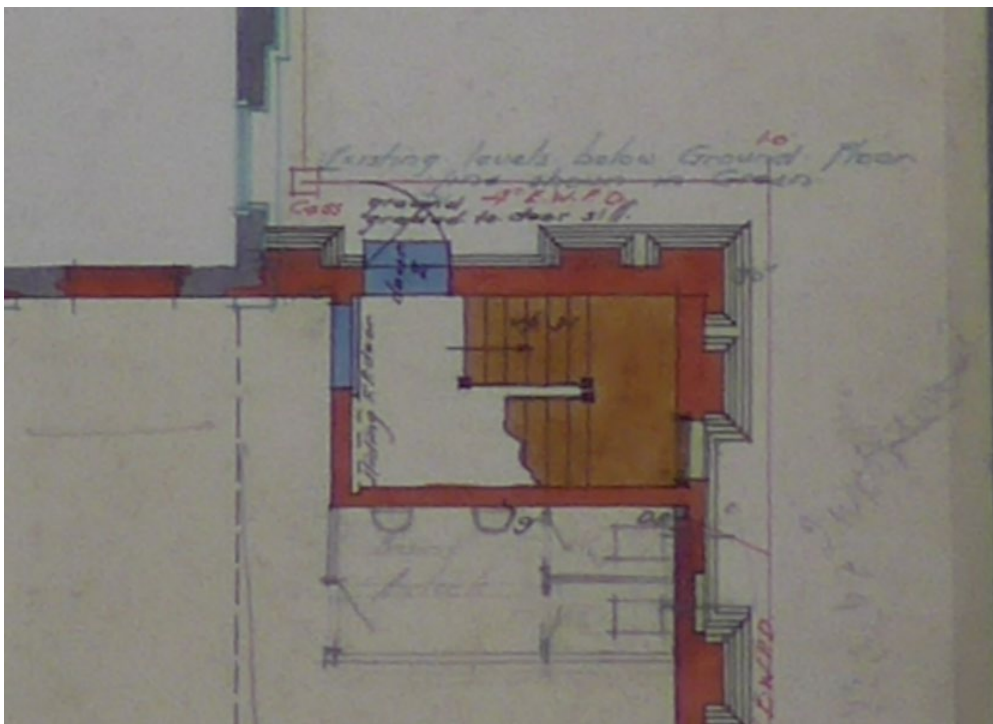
Ground floor plan showing stairs to Victoria Street wing providing access to carpark, 1925
